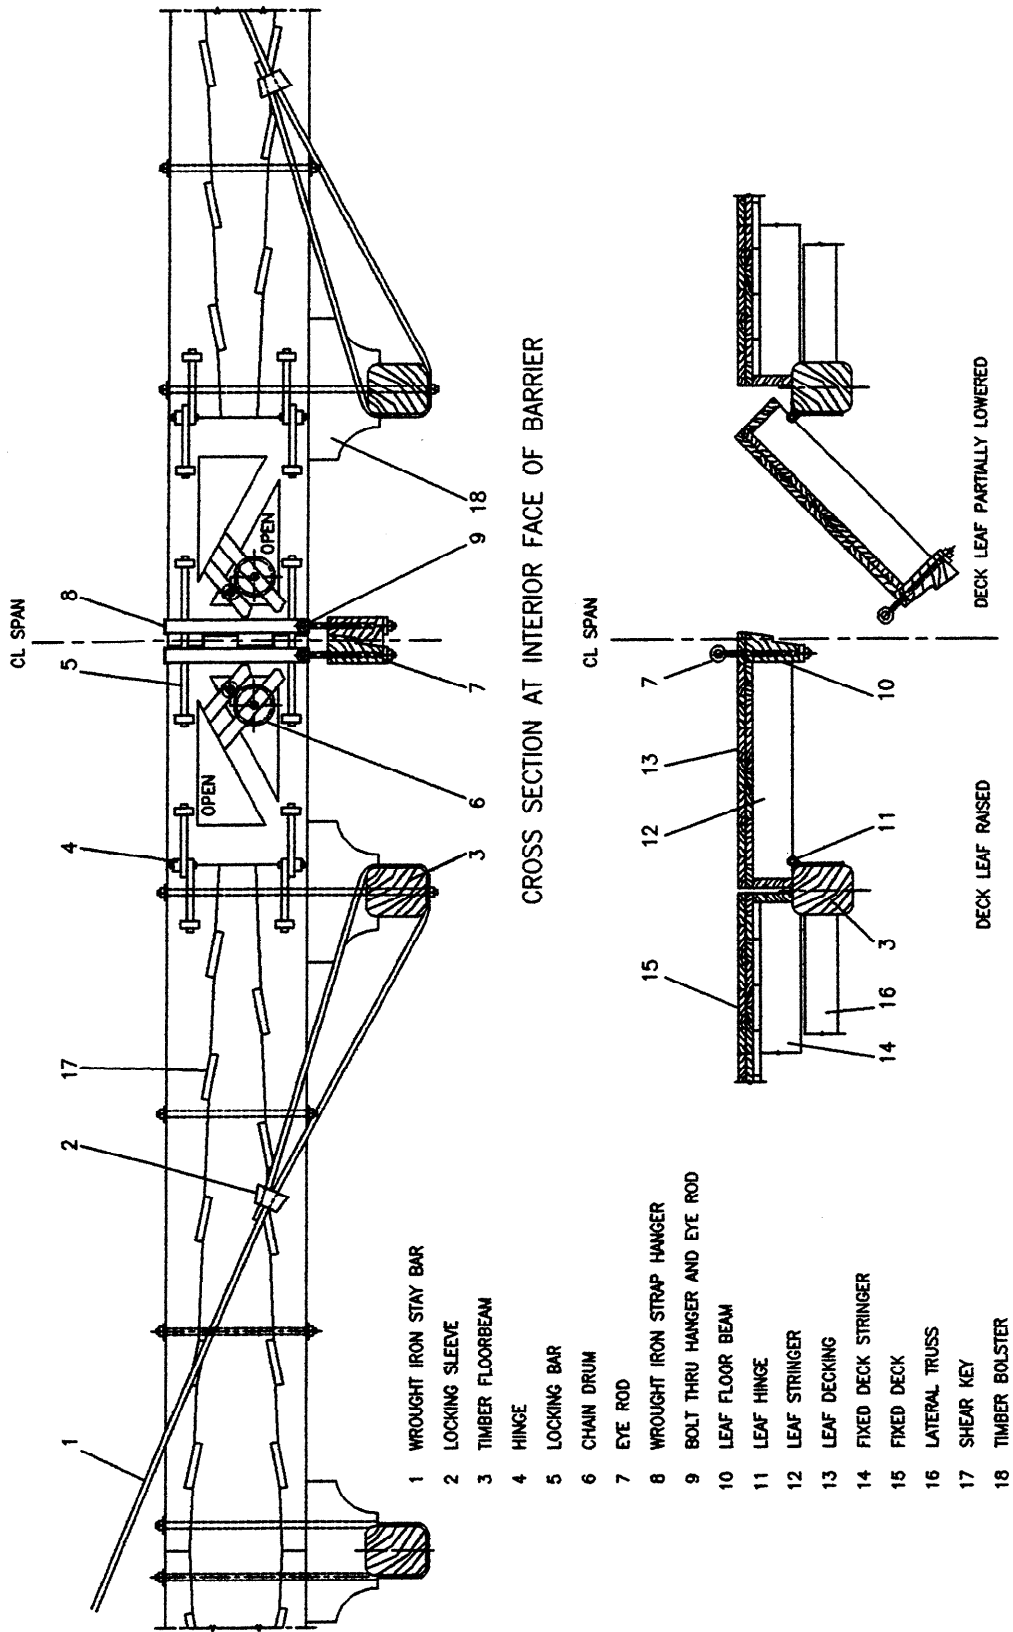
LONGITUDINAL SECTIONS THROUGH DECK
